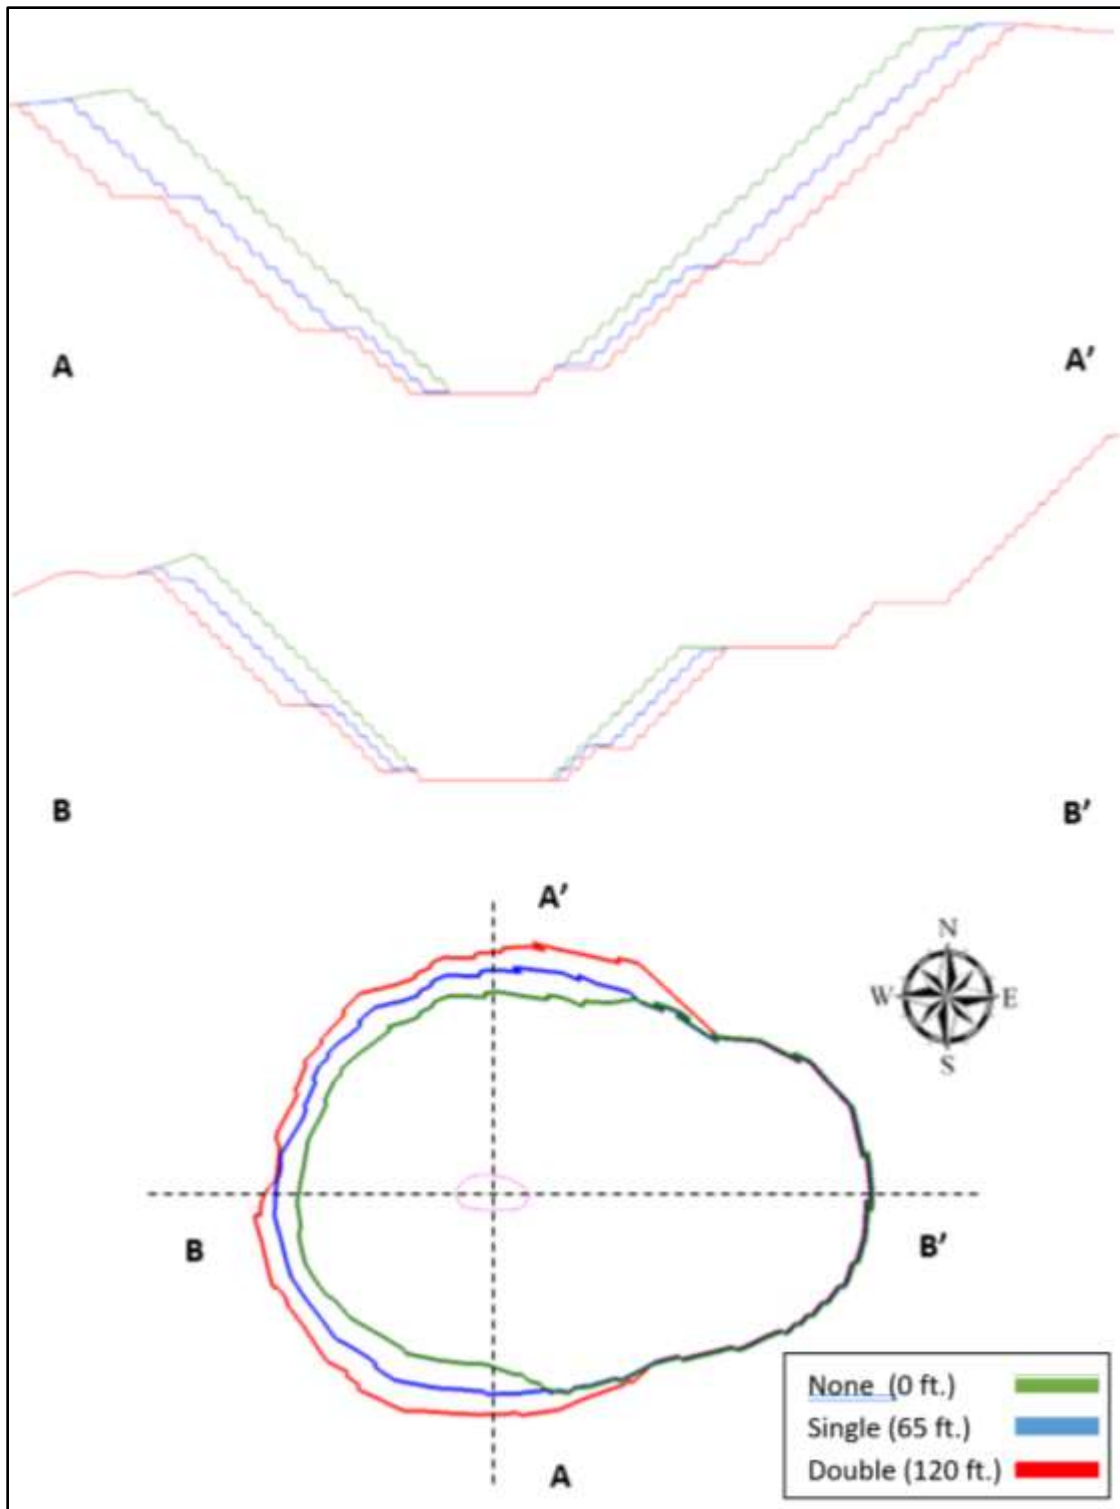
Cross-sections and Cross-sections on the Pit Plan View
